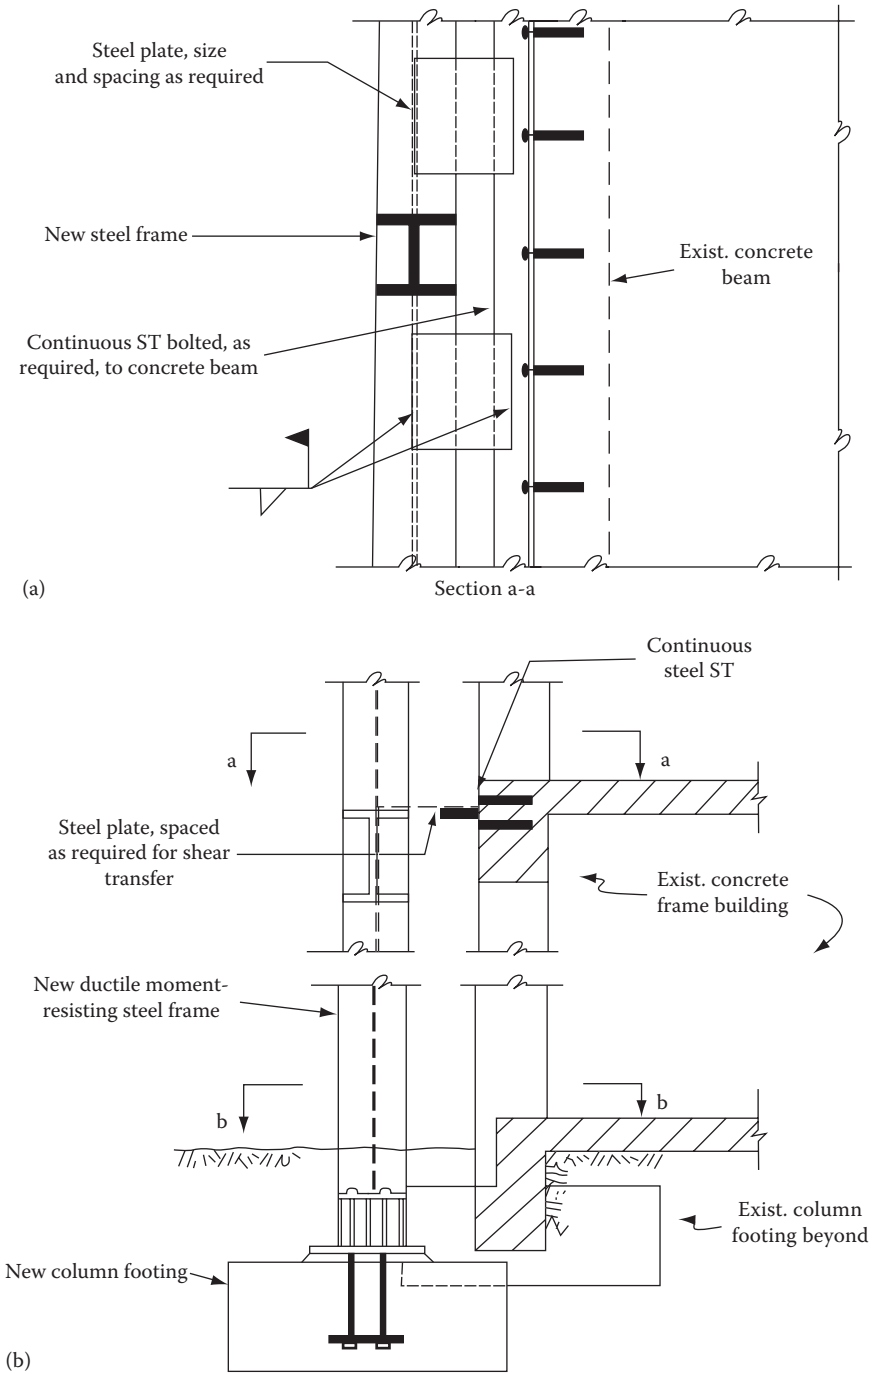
Upgrading an existing building with external frames. (a) Plan and (b) section at existing wall.
